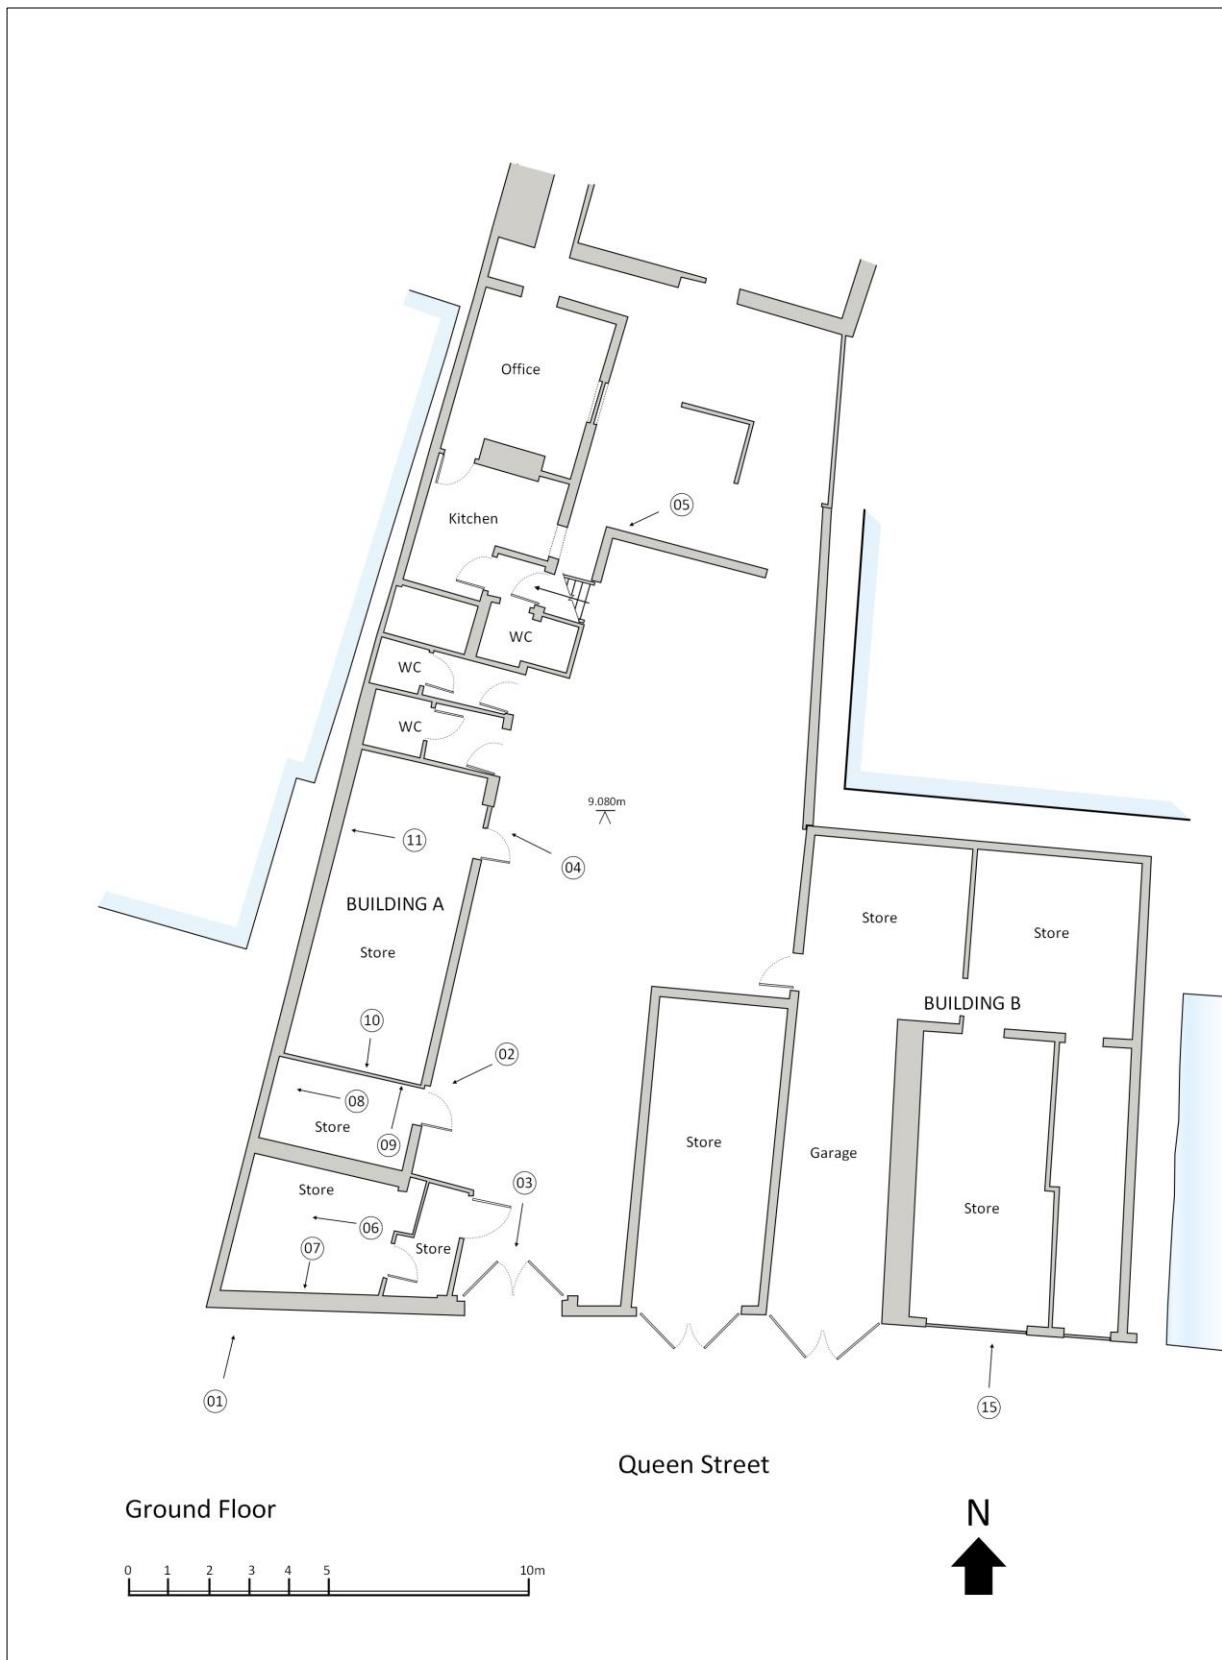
Ground-floor plan of outbuildings to the rear of No. 13 High Street Budleigh Salterton
